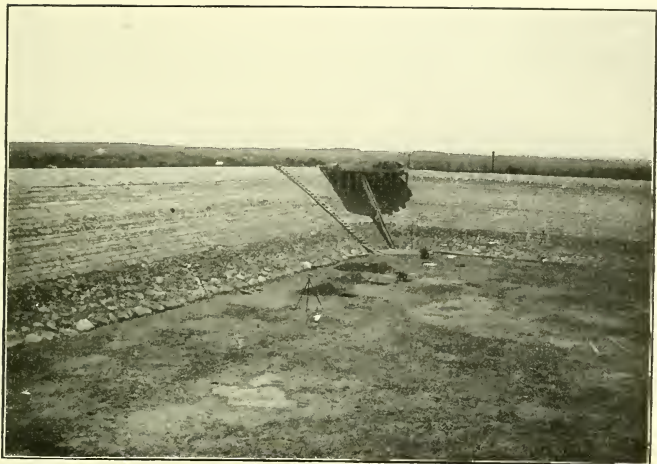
RESERVOIR BEFORE CONSTRUCTION OF ROOF WAS BEGUN.
